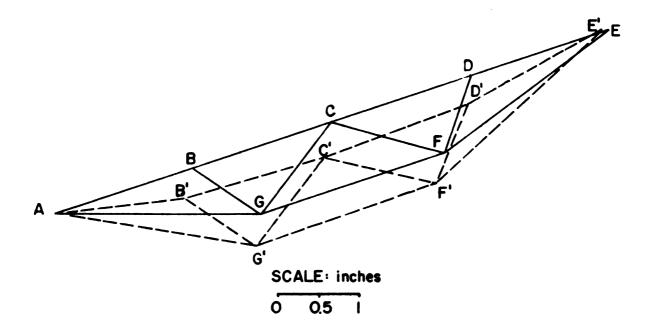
THEORETICAL DEFLECTION OF TRUSS "B"30 POUNDS PER SQUARE FOOT LOAD ON TRUSS TRUSS SPACING IS 4 FEET ON CENTER.
